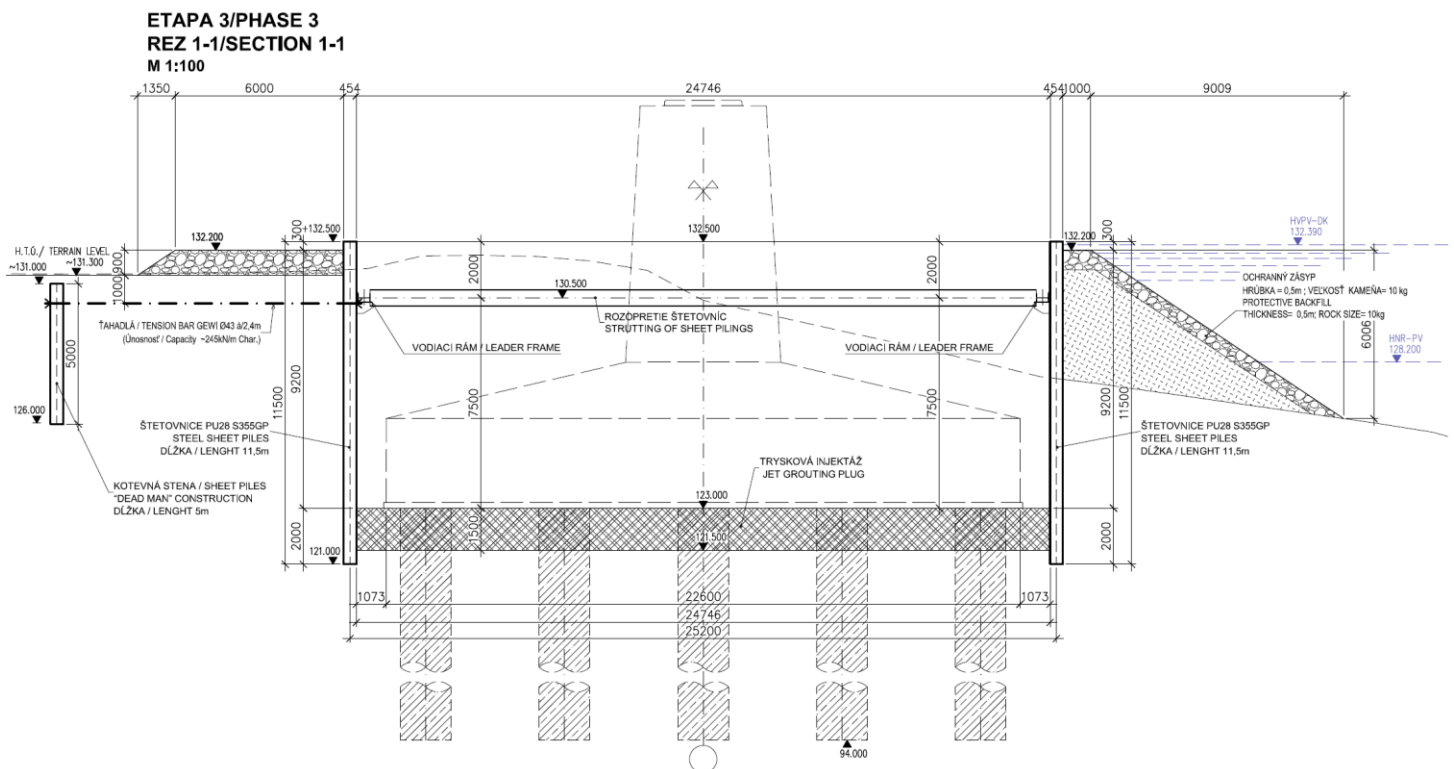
Cross section of the auxiliary construction pit, bracing frames, drilled piles and jet grouting plug for Kayak pier D2
